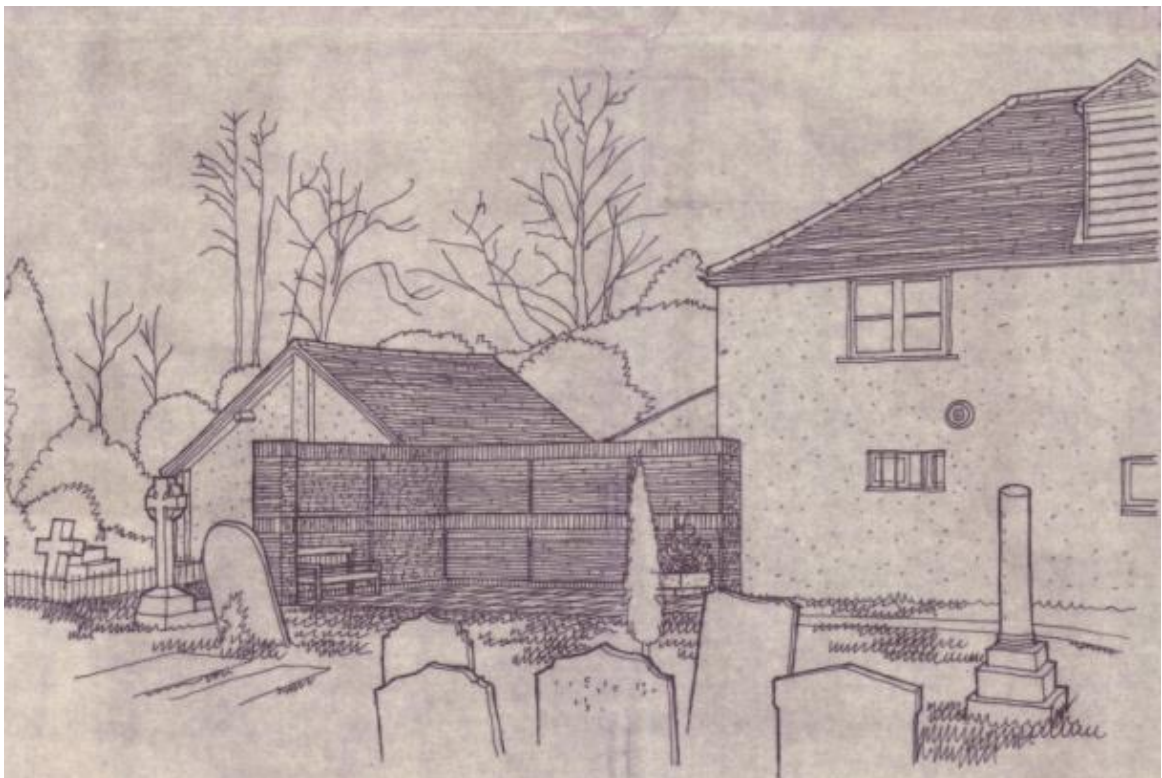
Proposed rear elevation in 1981 (ref. N06849b).
